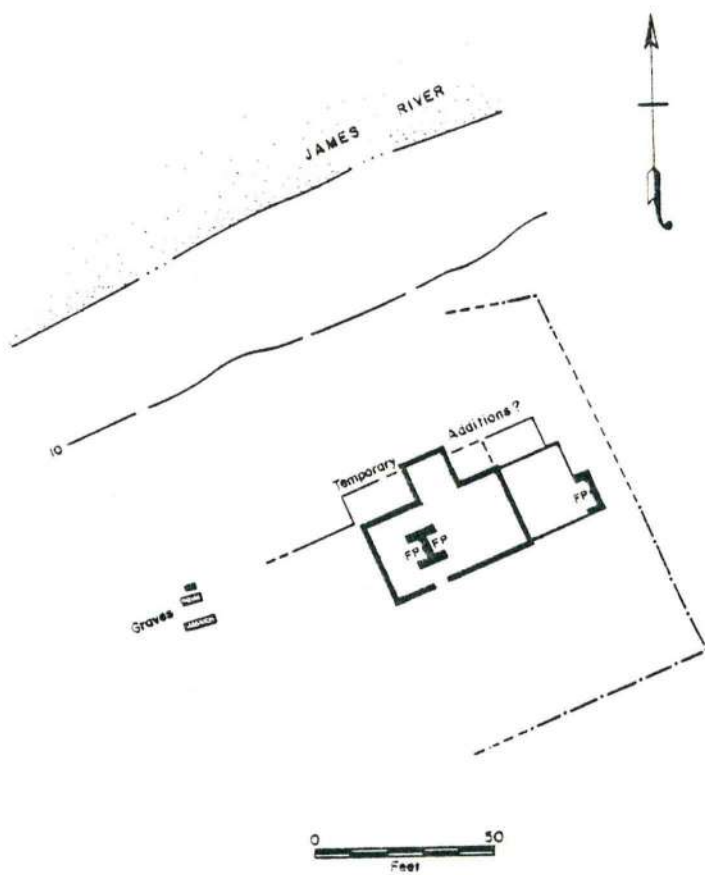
STONE HOUSE FOUNDATION c.1625-1650
